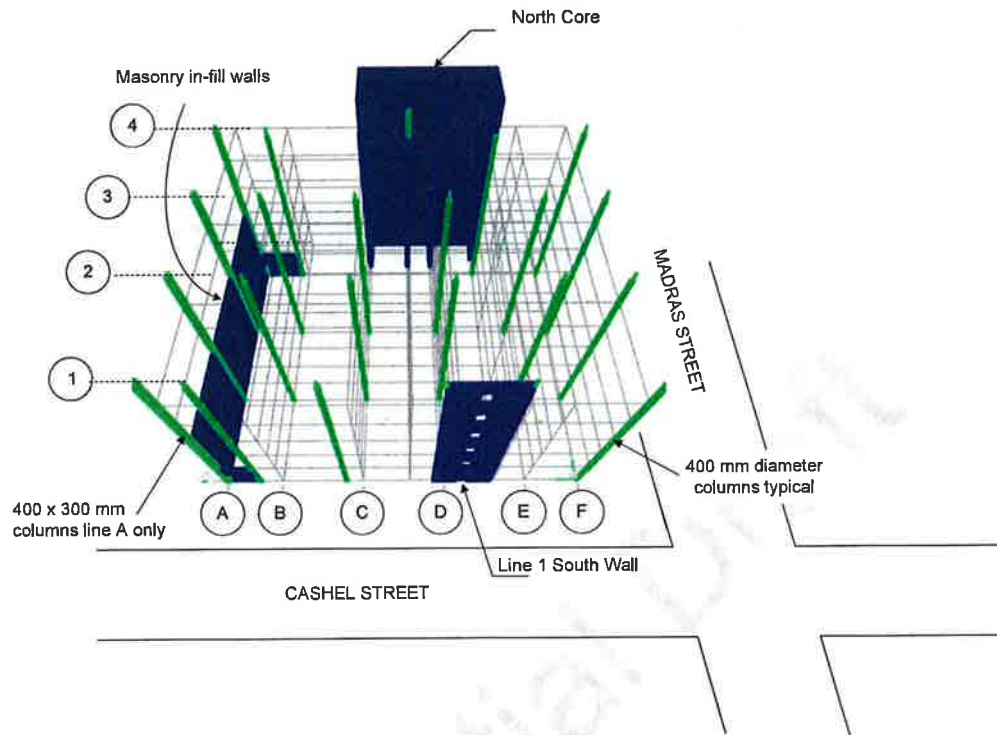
Building orientation and grid lines used in the report. (Note that this diagram is not to scale nor is the building positioned accurately relative to the roads)
